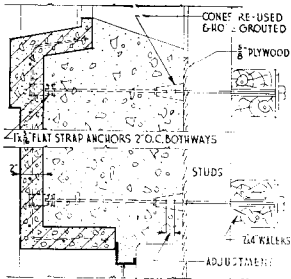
Section through spandrel showing details of anchoring slabs for use as forming on Naval Experimental Basin buildings.
